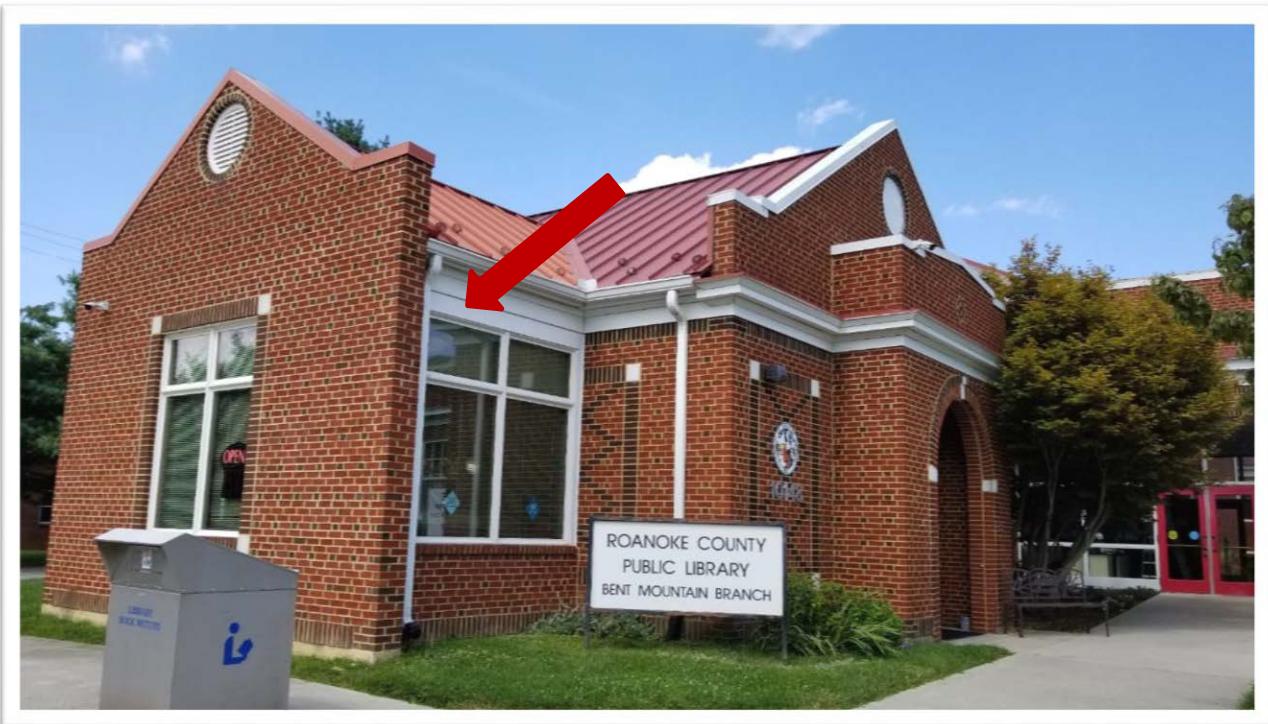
Facing NE - West facing façade of facility – 1930s building
